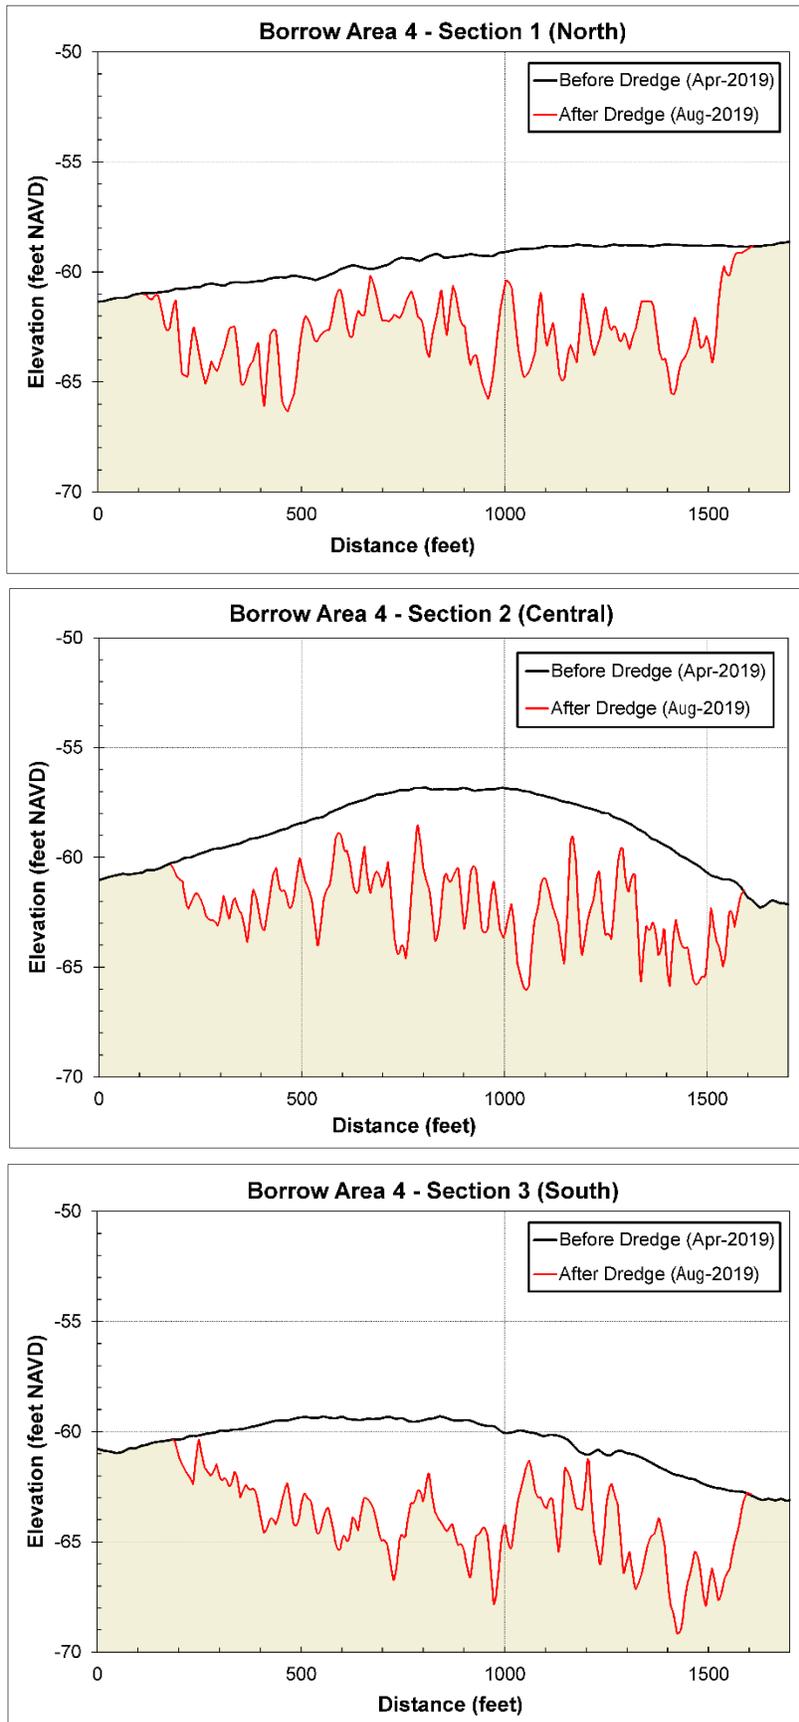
Representative cross-sections through Borrow Area 4 highlighting excavation during construction. Locations of these cross-sections are marked in Figure 7.2.
